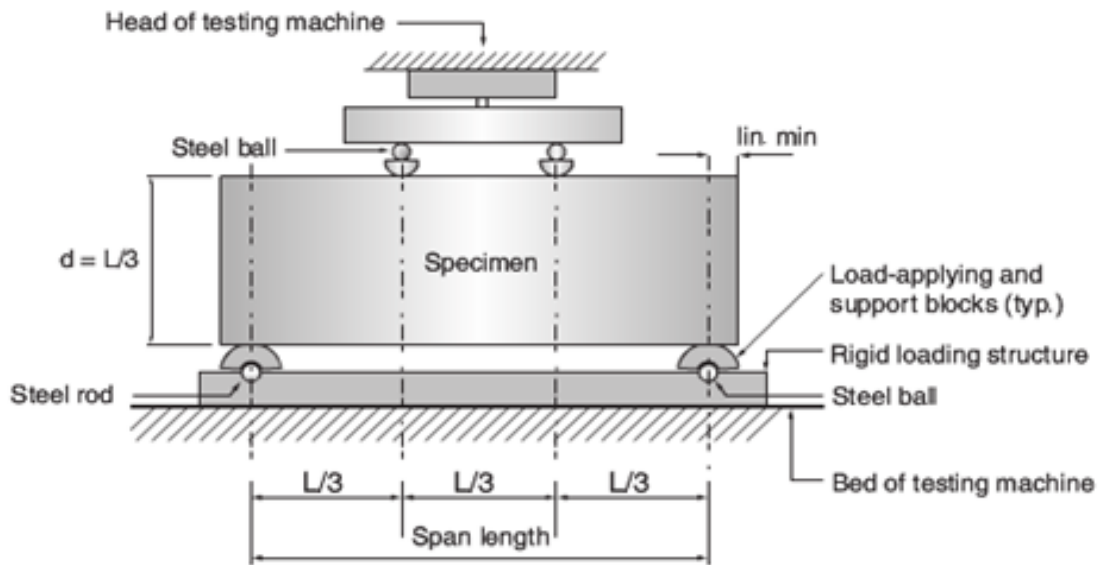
Cross-sectional view of flexural beam testing apparatus (Papapostas and Alderson 2013)
